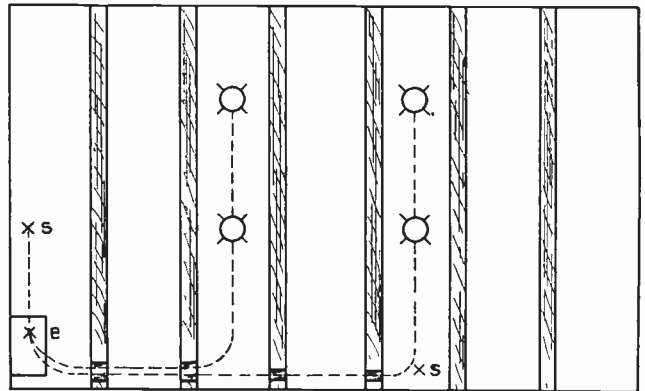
Ceiling joists should not be notched in their centers in order to run conduit by the shortest path to outlets. Instead the joists should be notched near walls or supports, and the conduit bent to run through these notches, and then back between the joists to the outlets as shown in this diagram.
